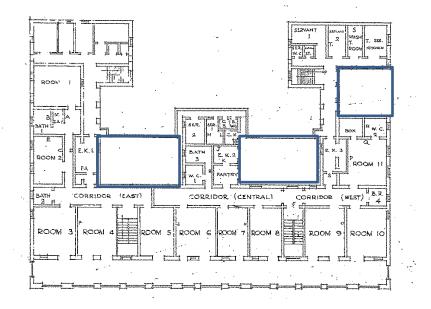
Roof terraces on 2/F plan before 1949 [ArchSD plan modified by author]
